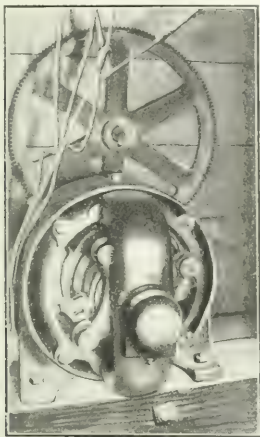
Motor-Driven Concrete Mixer at Bay Street Plant.
